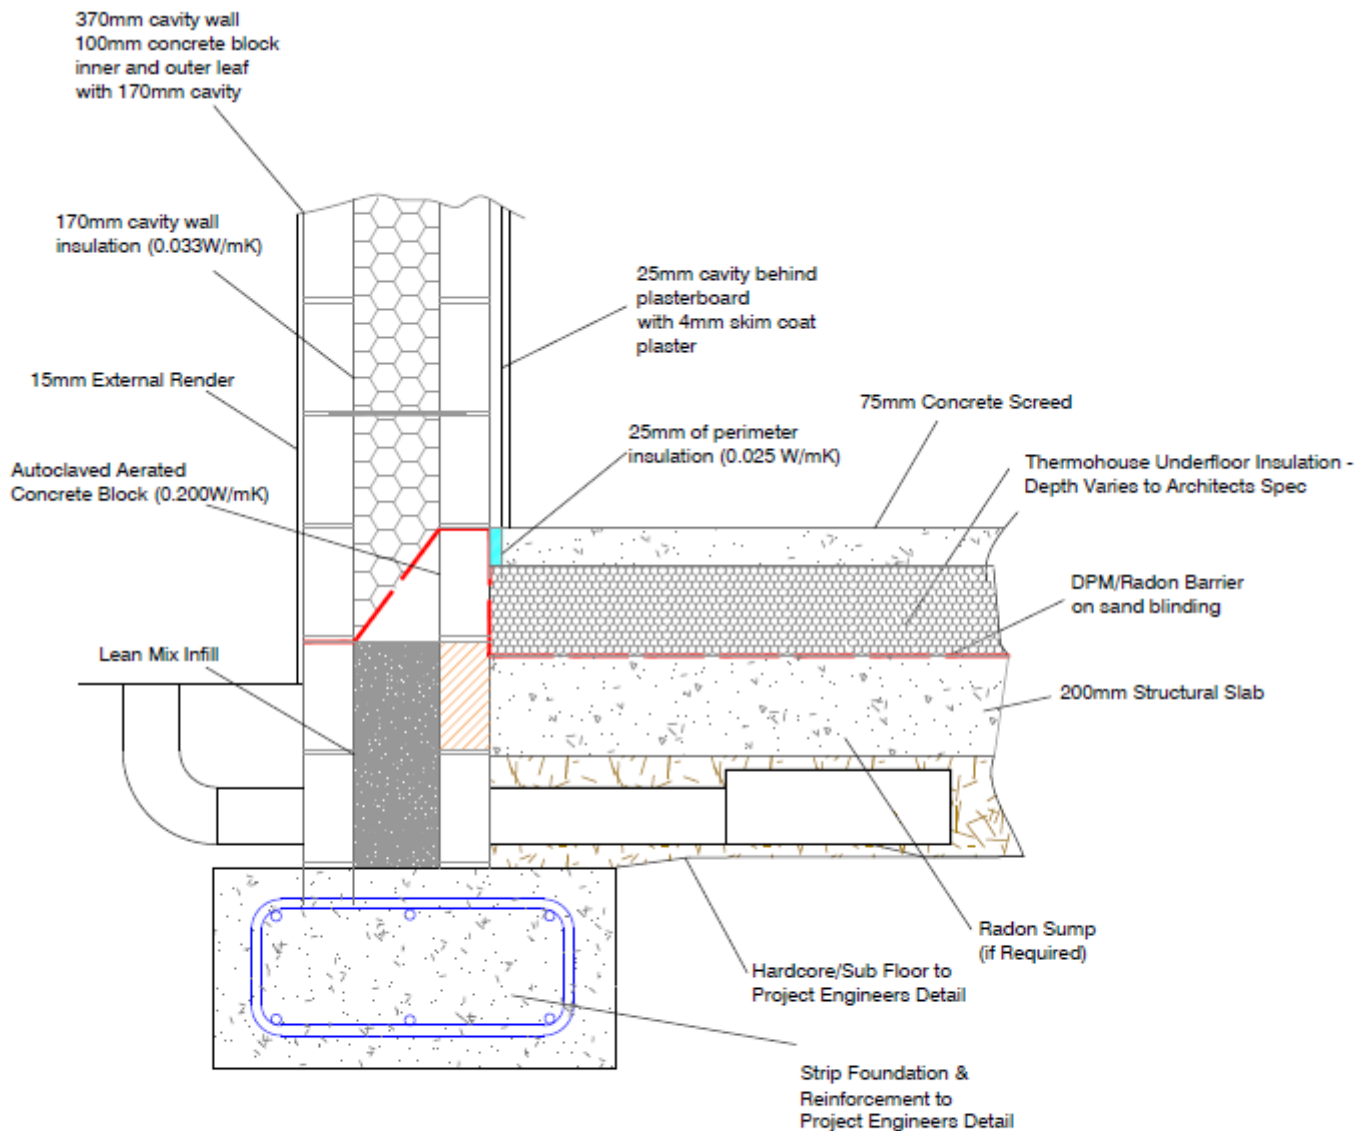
Strip Foundation with 370mm Cavity Wall and Concrete Screed on Insulation
